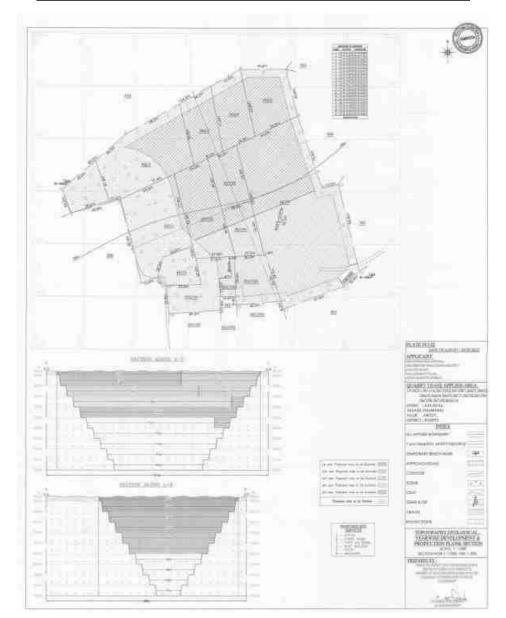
PROJECT LAYOUT PLAN AND SECTIONS
